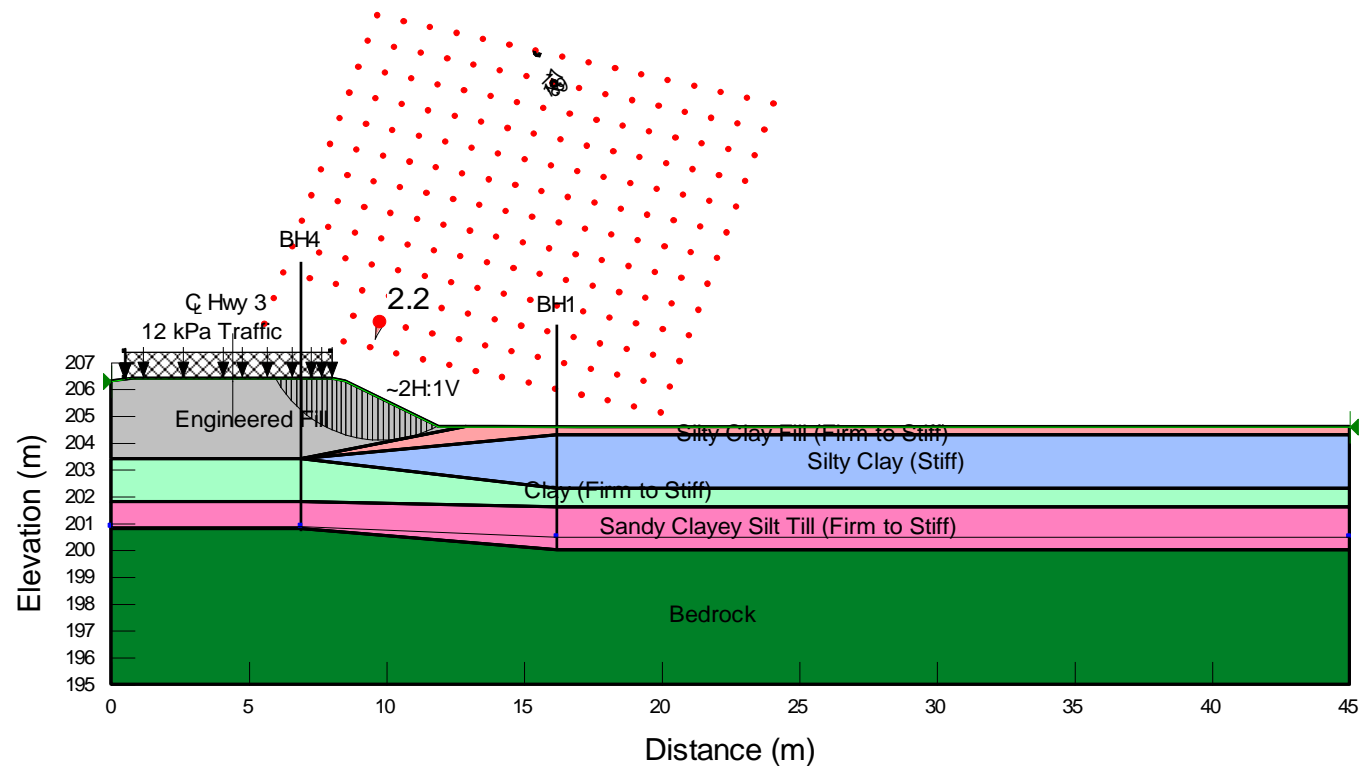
Slope stability analysis for embankment slope after culvert replacement with 2H:1V slope – undrained static conditions
